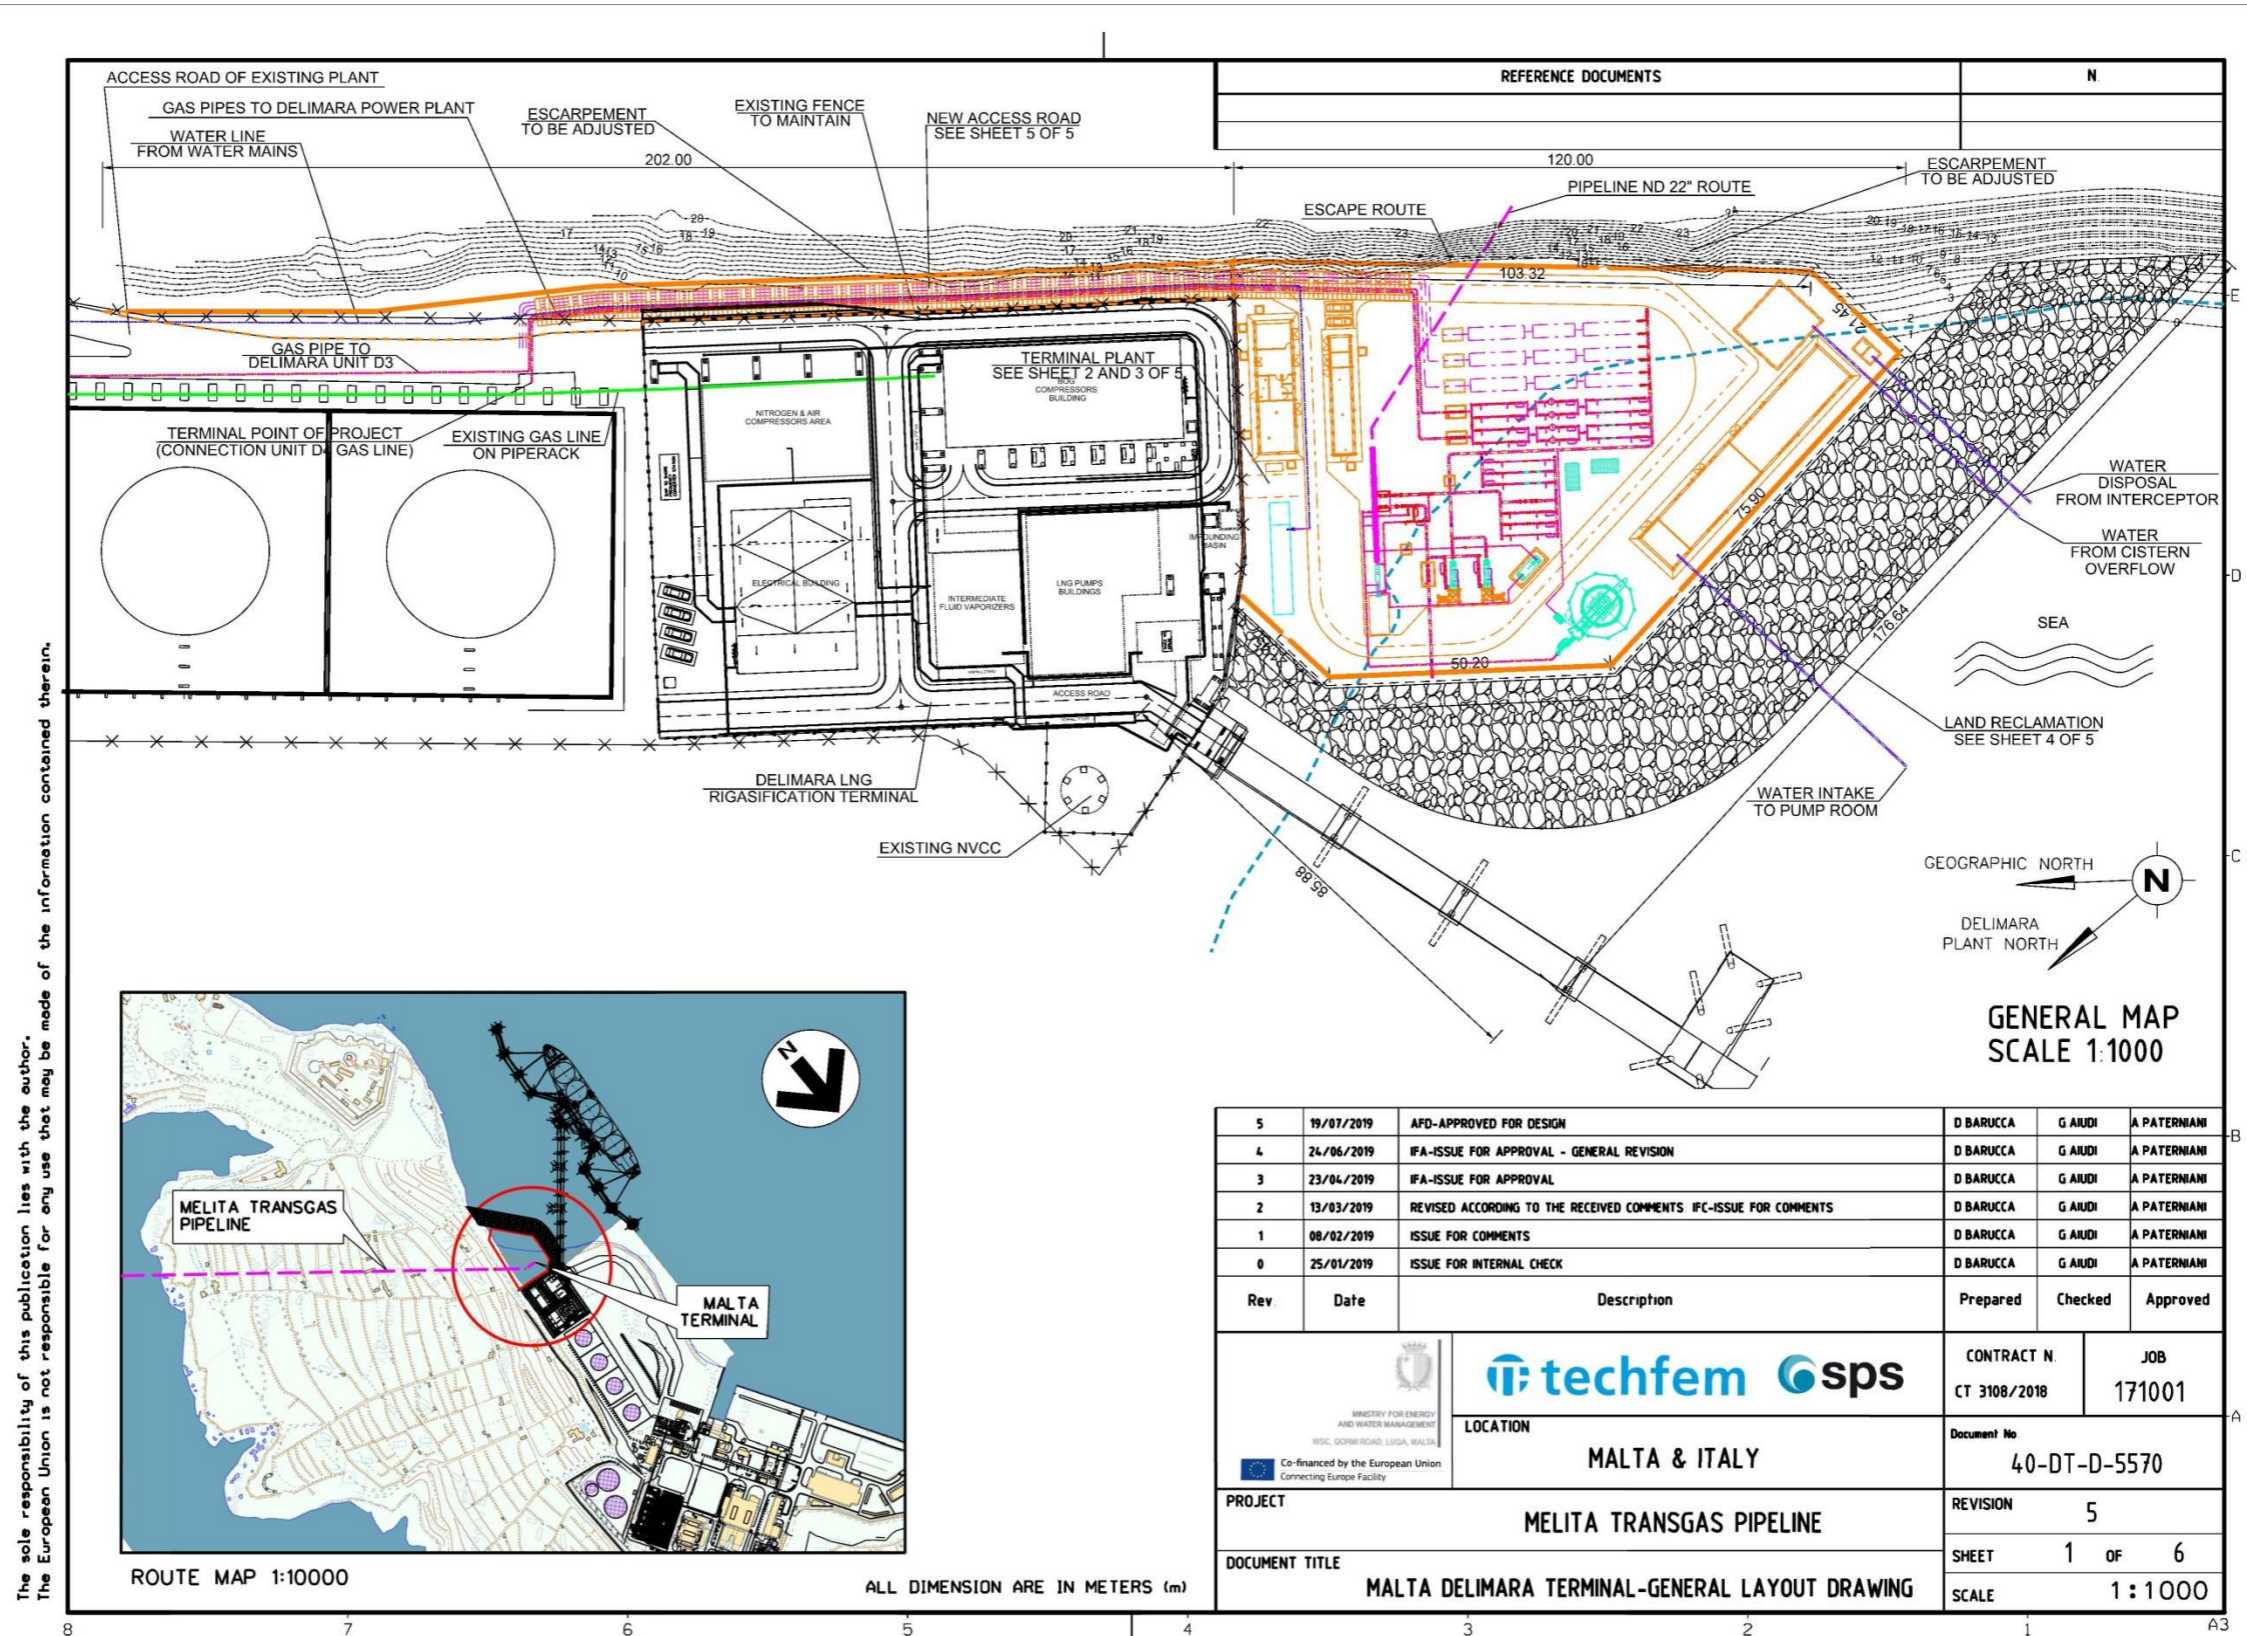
Site plan for the proposed Malta terminal and land reclamation area
